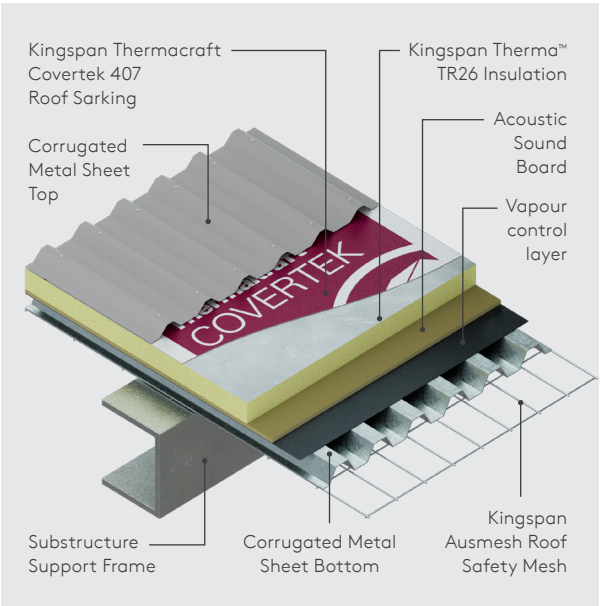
Kingspan Therma™ TR26 in a Built-up Metal Deck Roof with Acoustic Sound Board.
